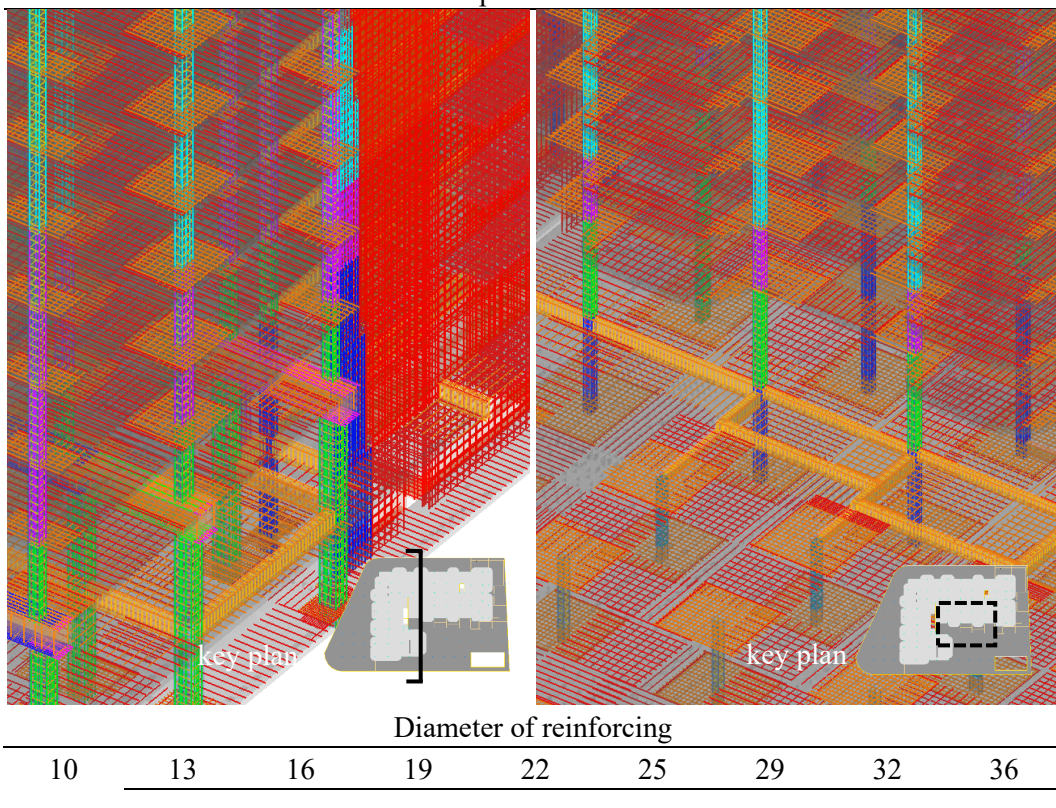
Diameter of reinforcement bars implemented in the numerical model [mm]
